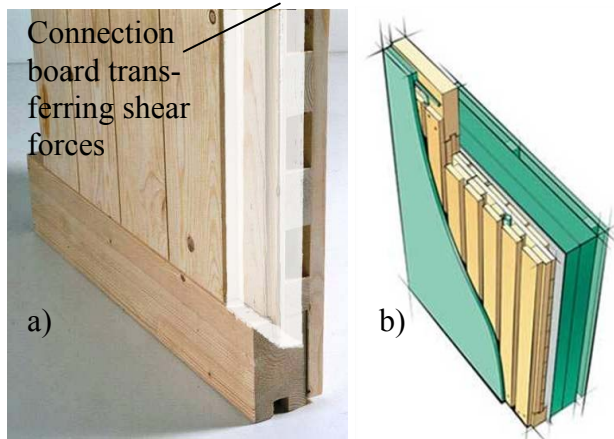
a) Close-up view of the bottom of a single X-lam massive panel, b) Panel with inner finish plus installation and outer insulation
